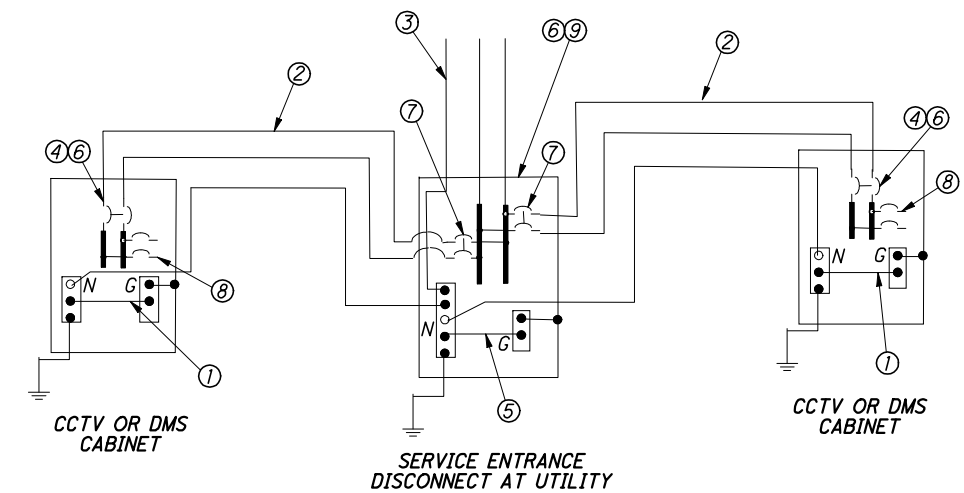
TYPICAL WIRING SCHEMATIC FOR A SINGLE DEVICE SITE
